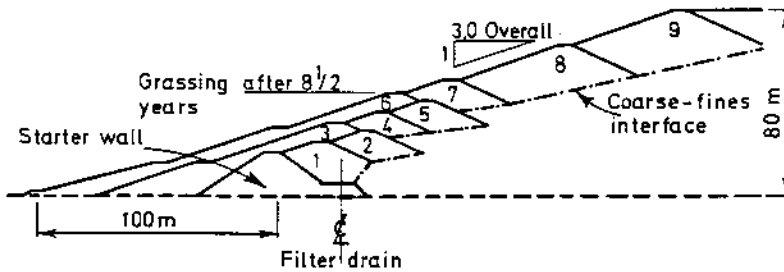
Combined upstream and downstream construction (Lyell & Prakke 1988).
